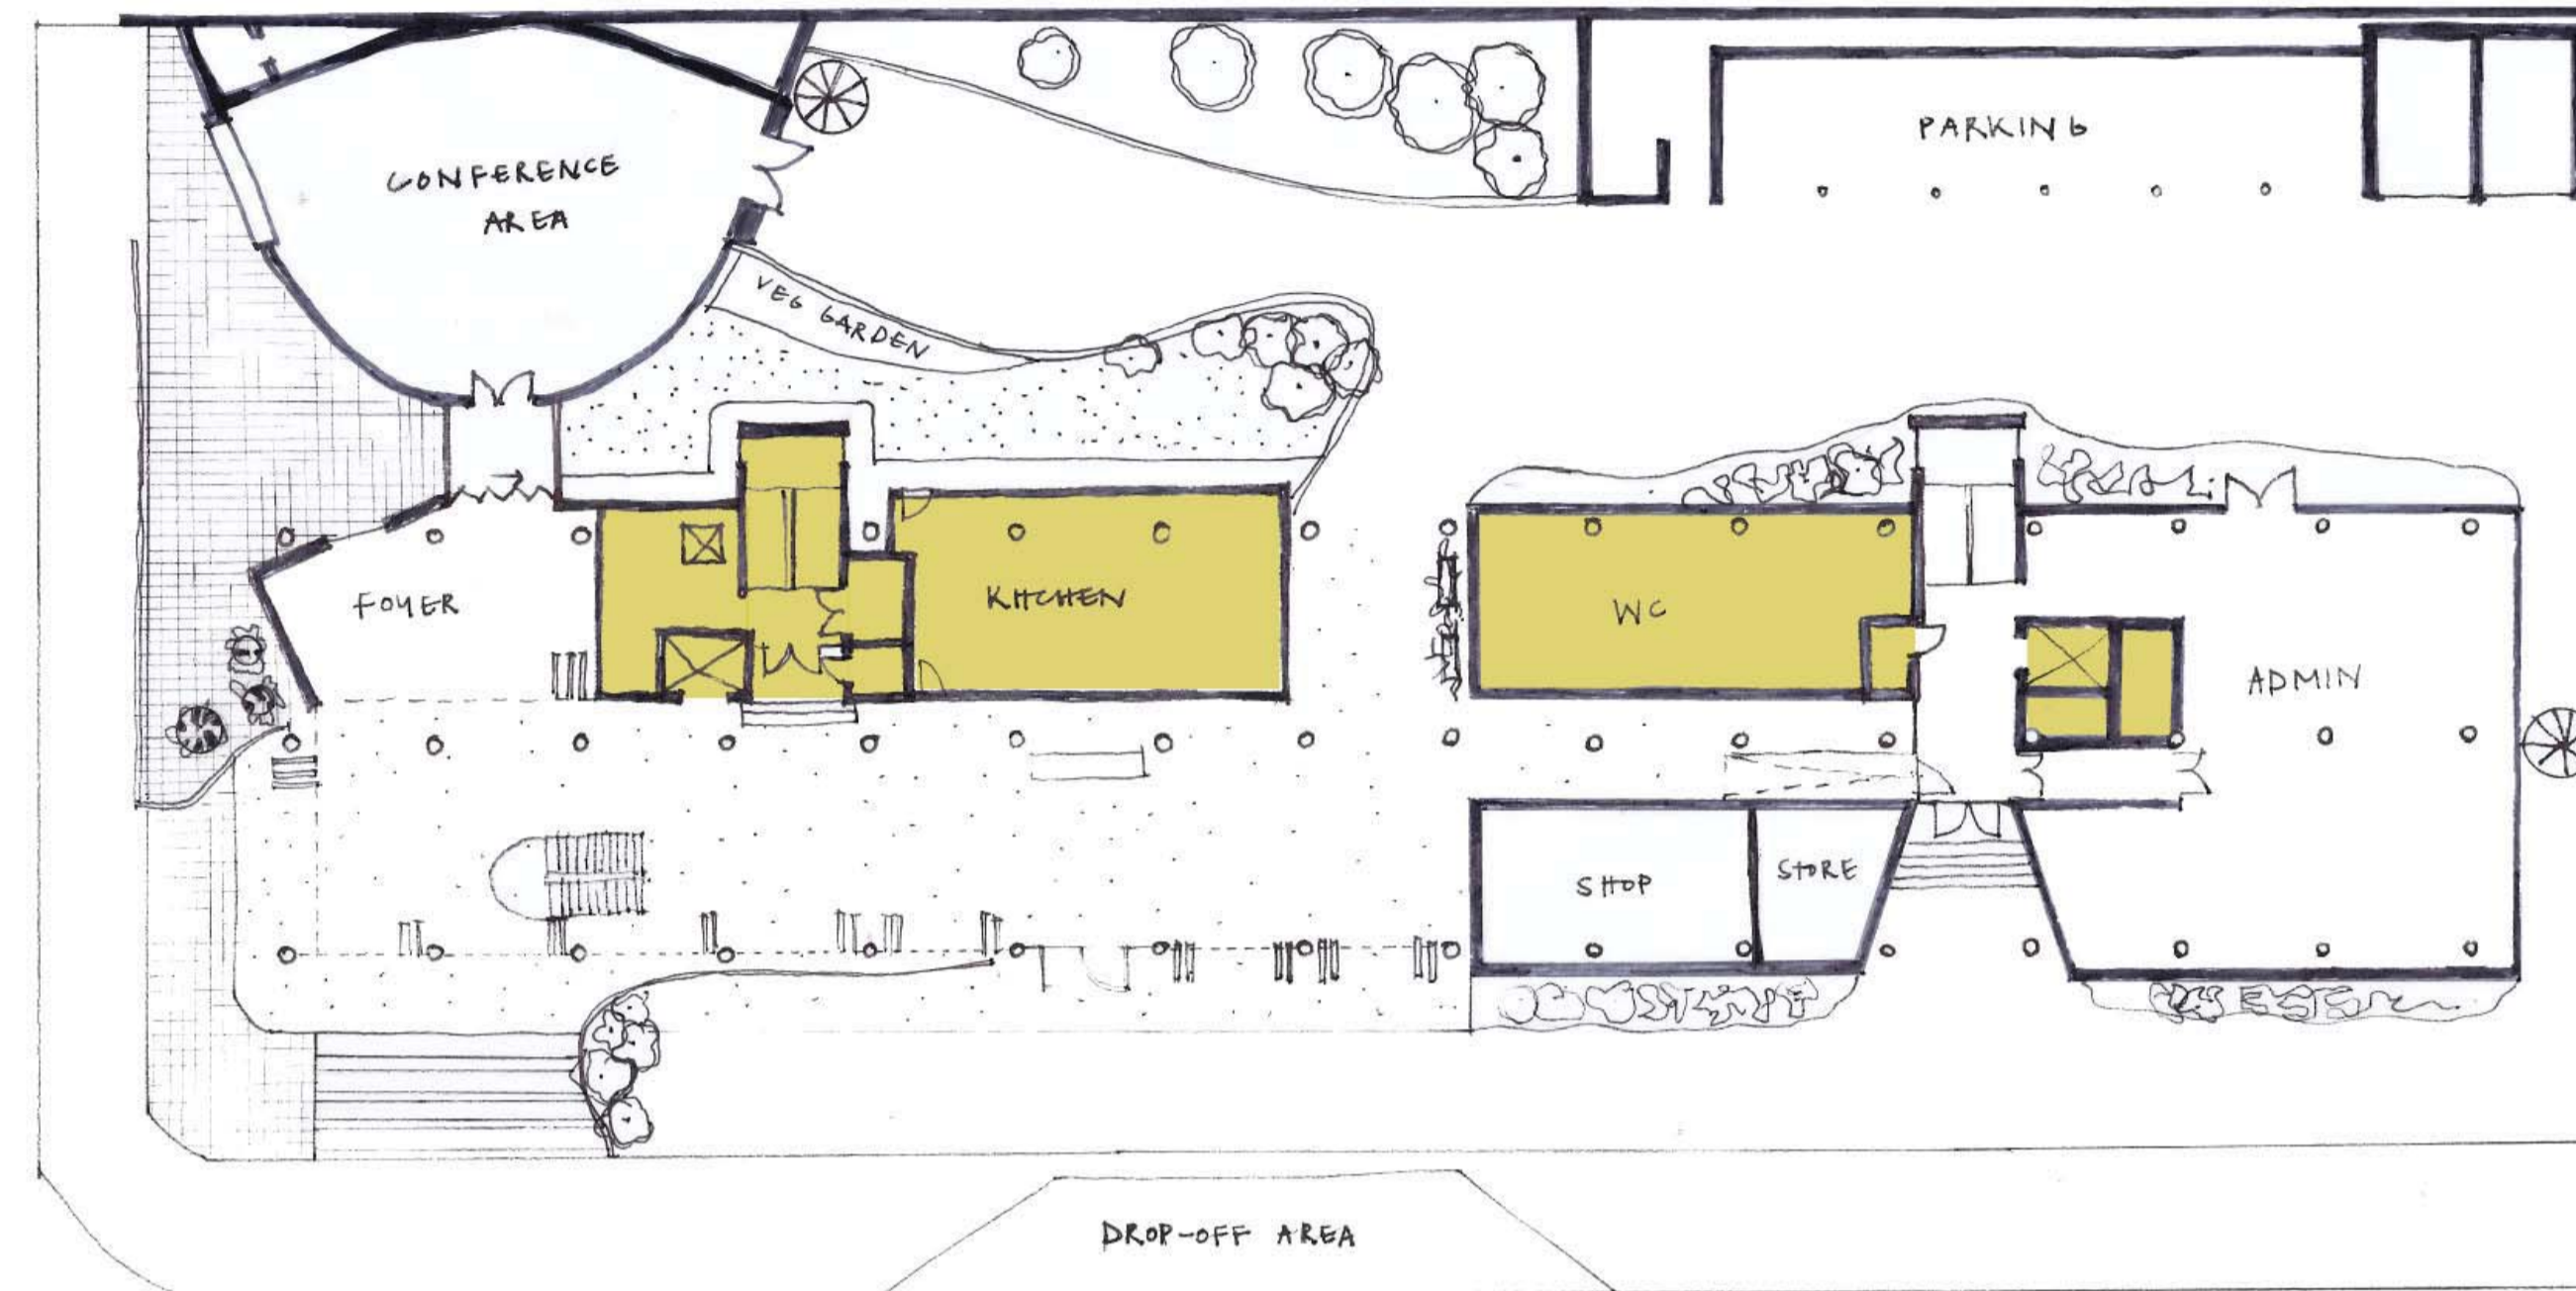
LOWER GROUND FLOOR ZONING PLAN
